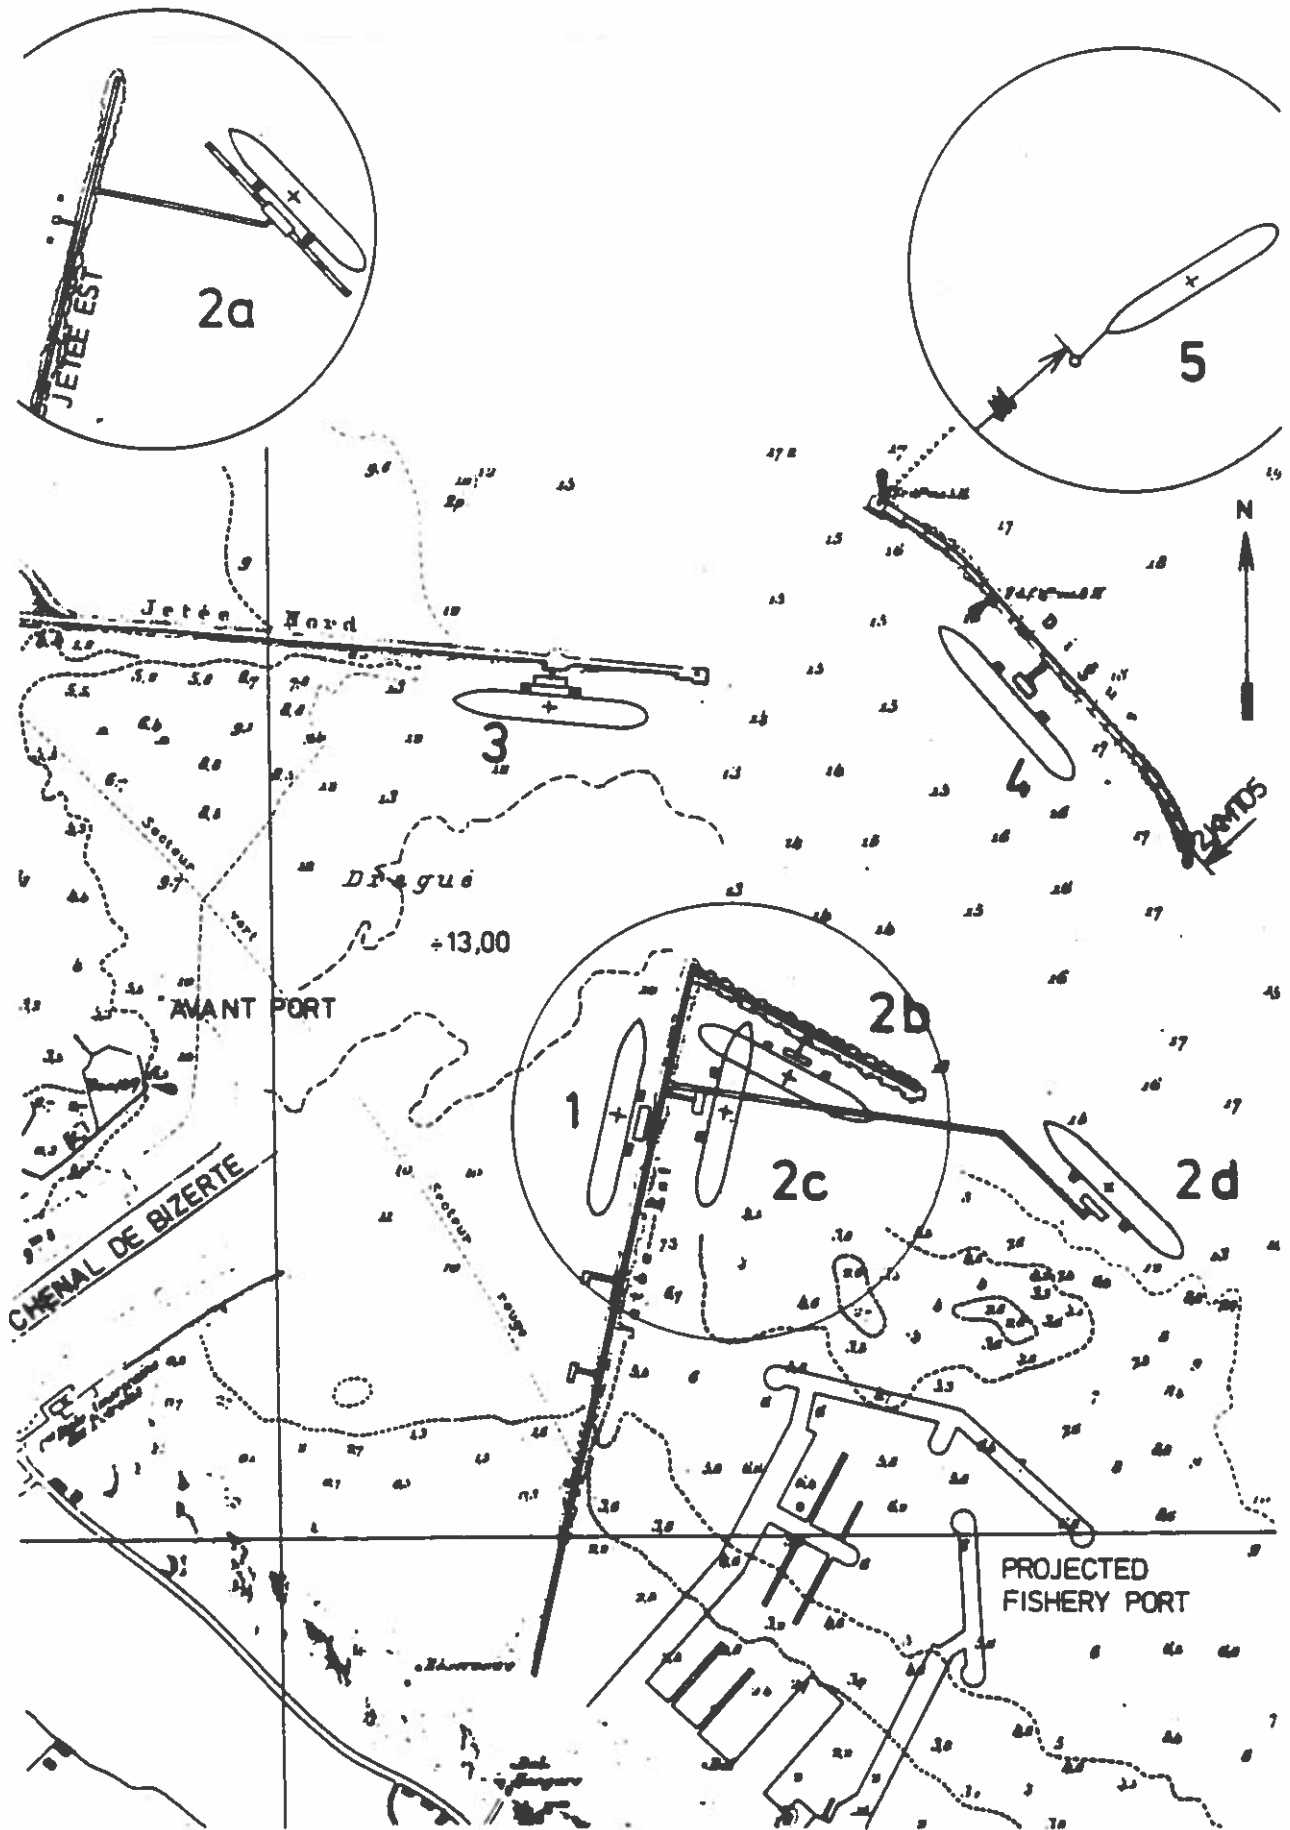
GENERAL PLAN. ALTERNATIVE BERTH LOCATIONS
